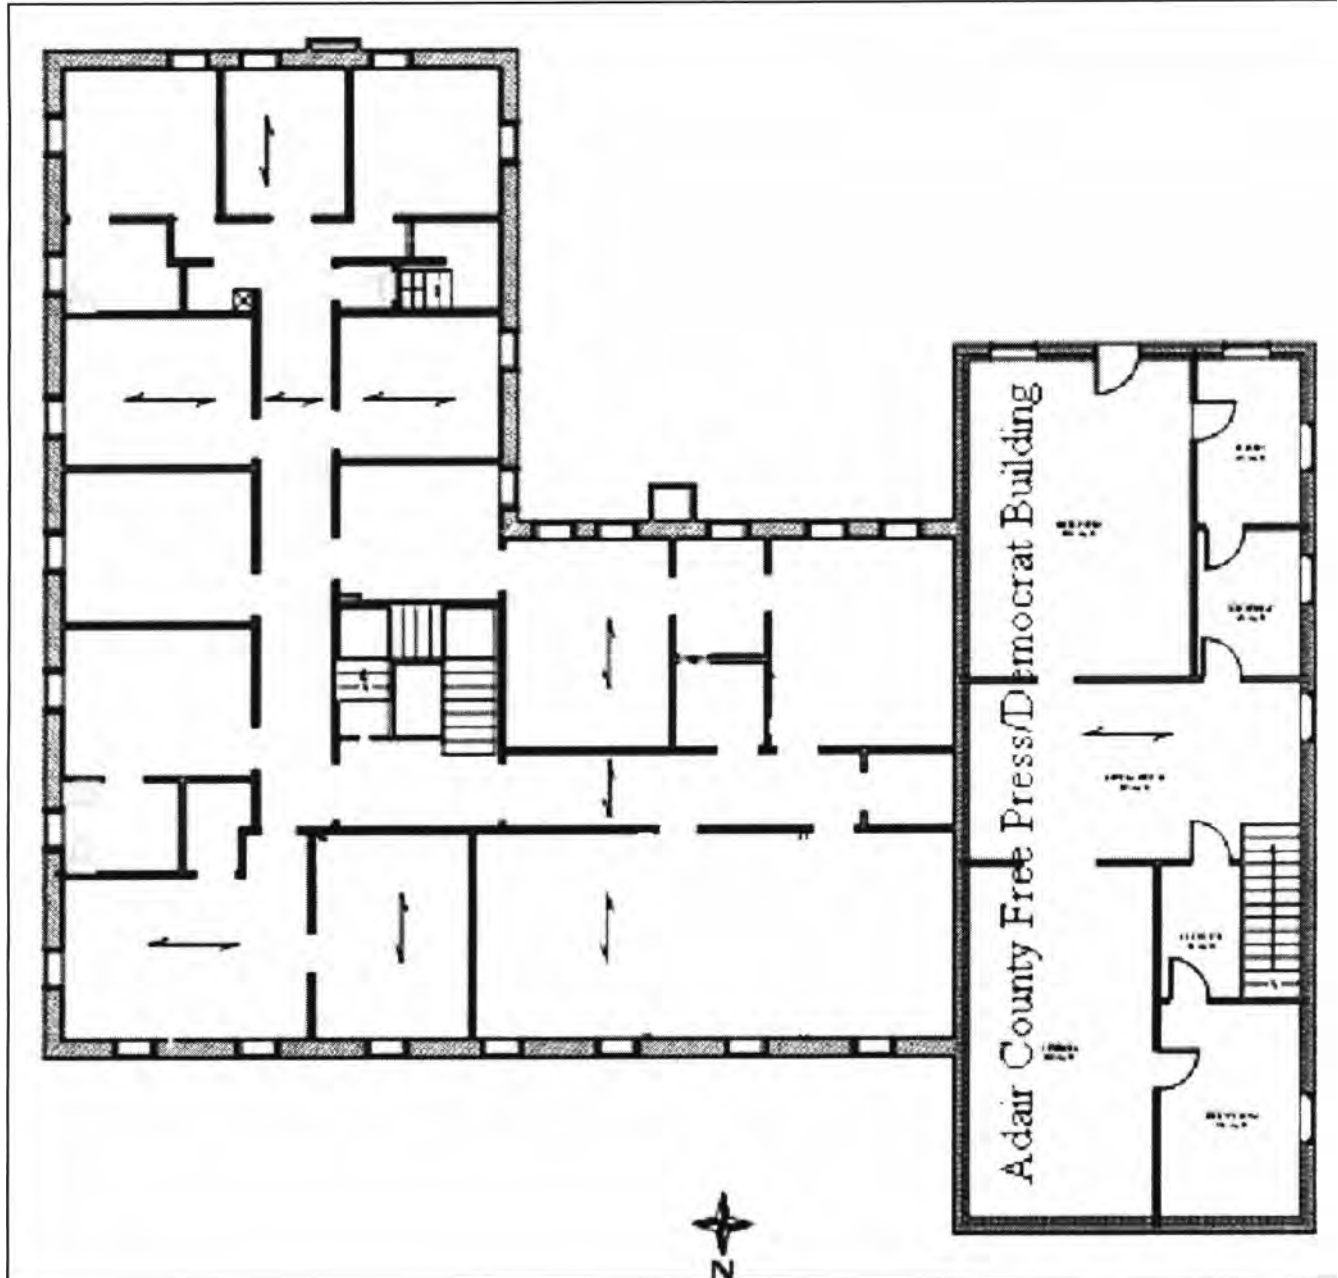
Pre-rehabilitation second floor plan (TBE Architects & Design, Inc., 2011)
